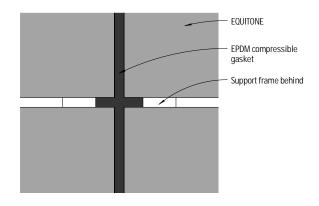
Open horizontal joint junction with vertical joint - Elevation
